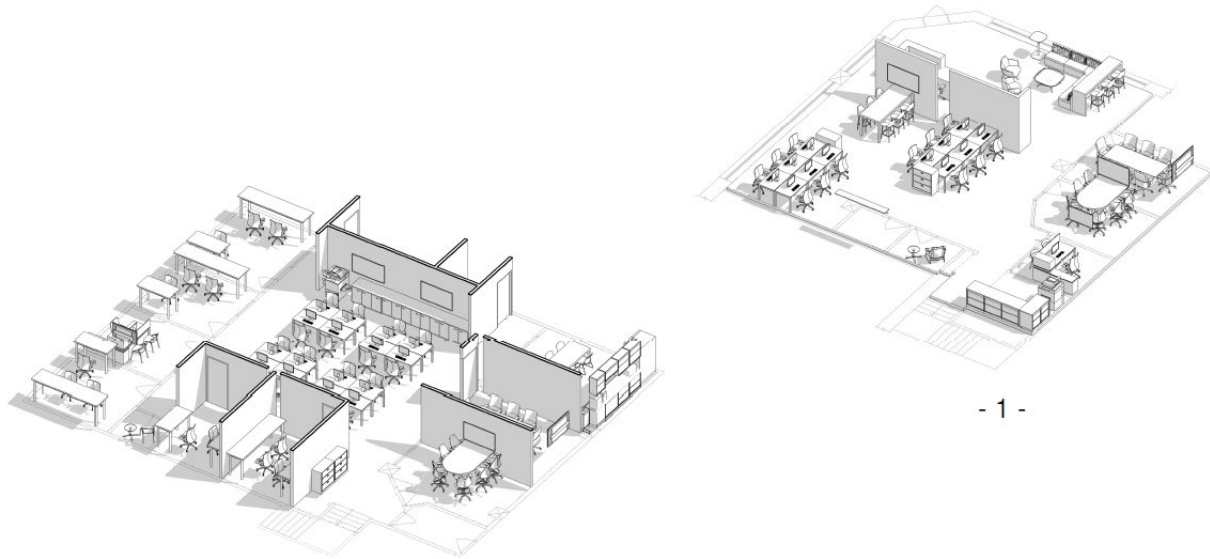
Excerpt of Proposed First Floor Level and Lower-Level Floor Plans
